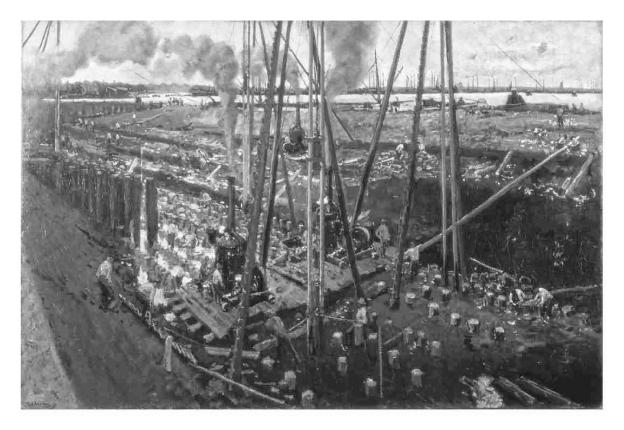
Piling at the Diemenstraat, Amsterdam, 1897, Breitner (1857-1929) (Gans, 2011).
